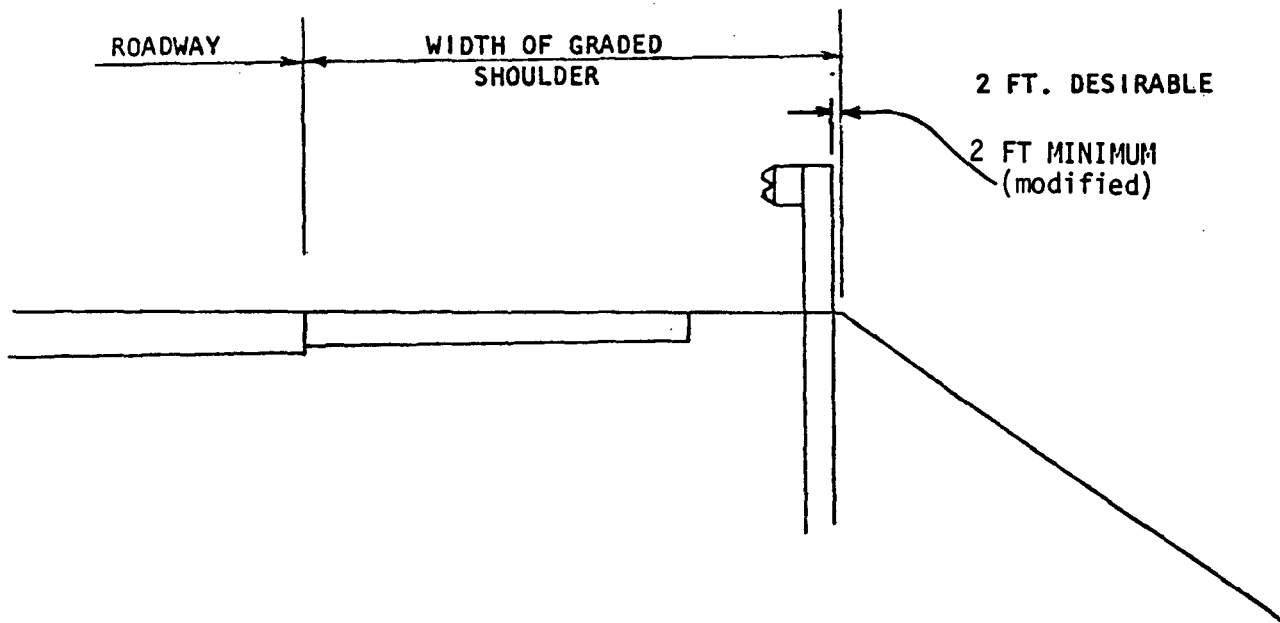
GUARDRAIL LOCATED ON THE GRADED SHOULDER
